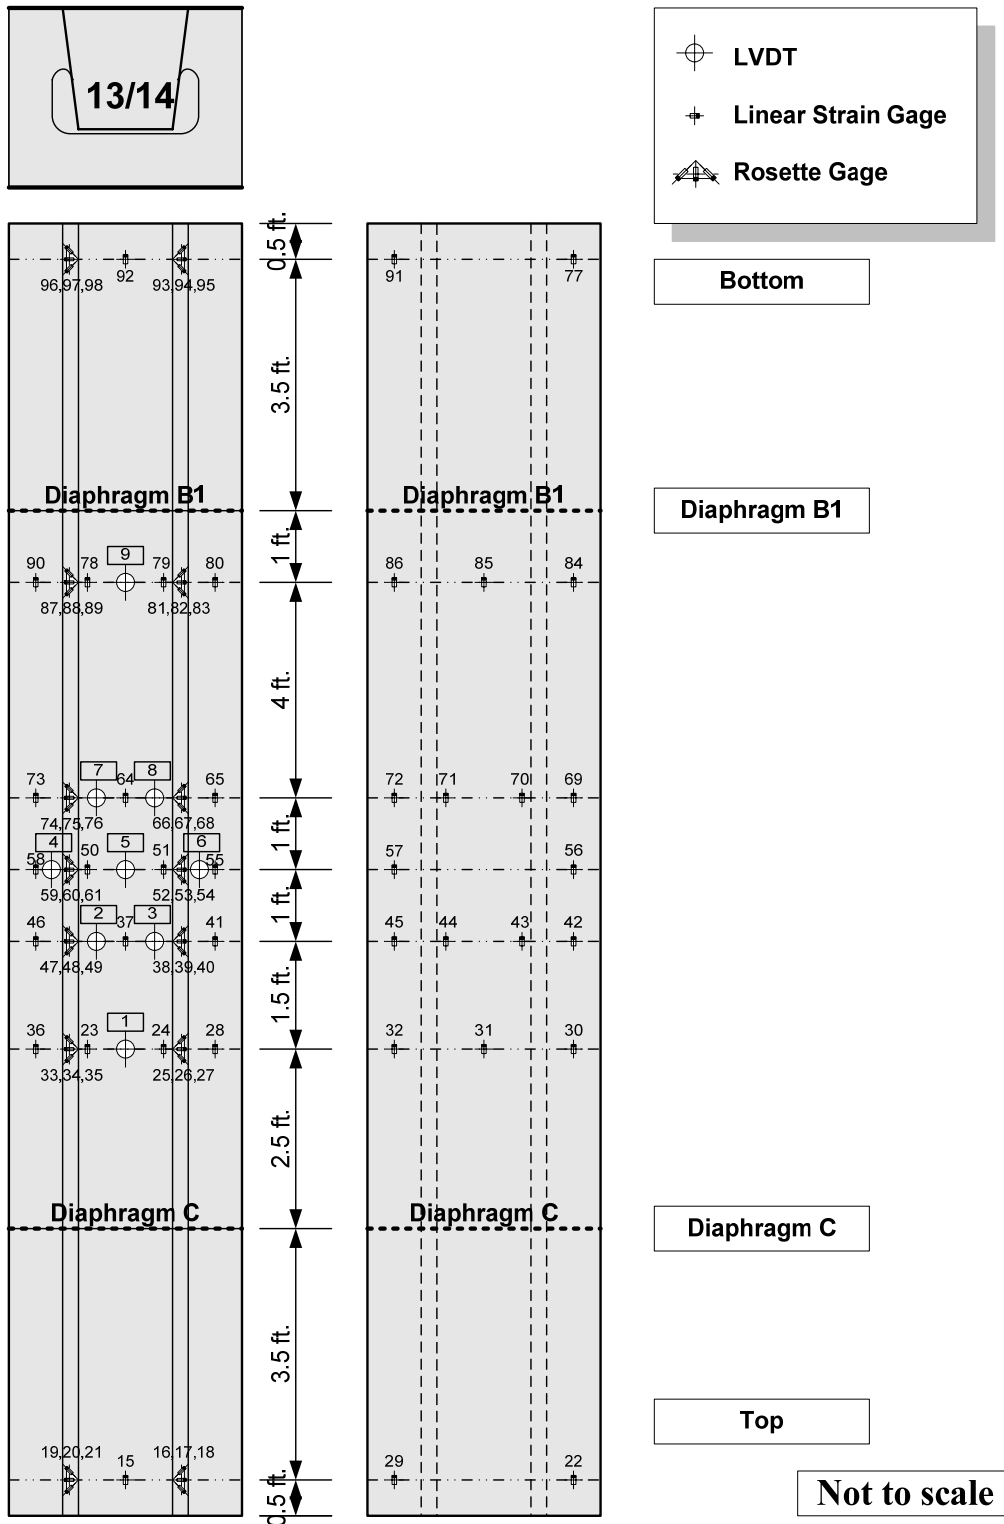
Instrumentation Plan for Single Rib Beam-column, SBC
